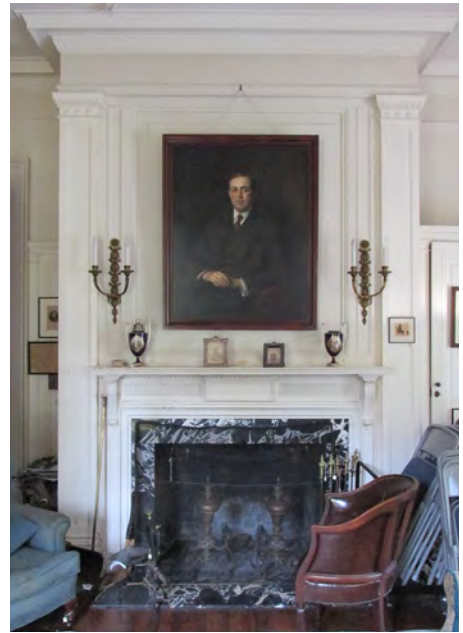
Pilasters framing fireplace in Library (105). (HA, 2015)
